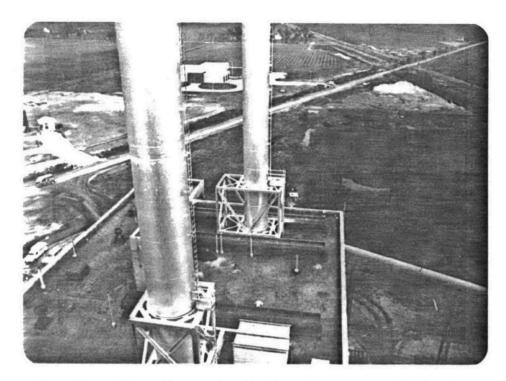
View from the boiler house roof facing southeast showing stacks 6 and 7 and the ash ponds.
